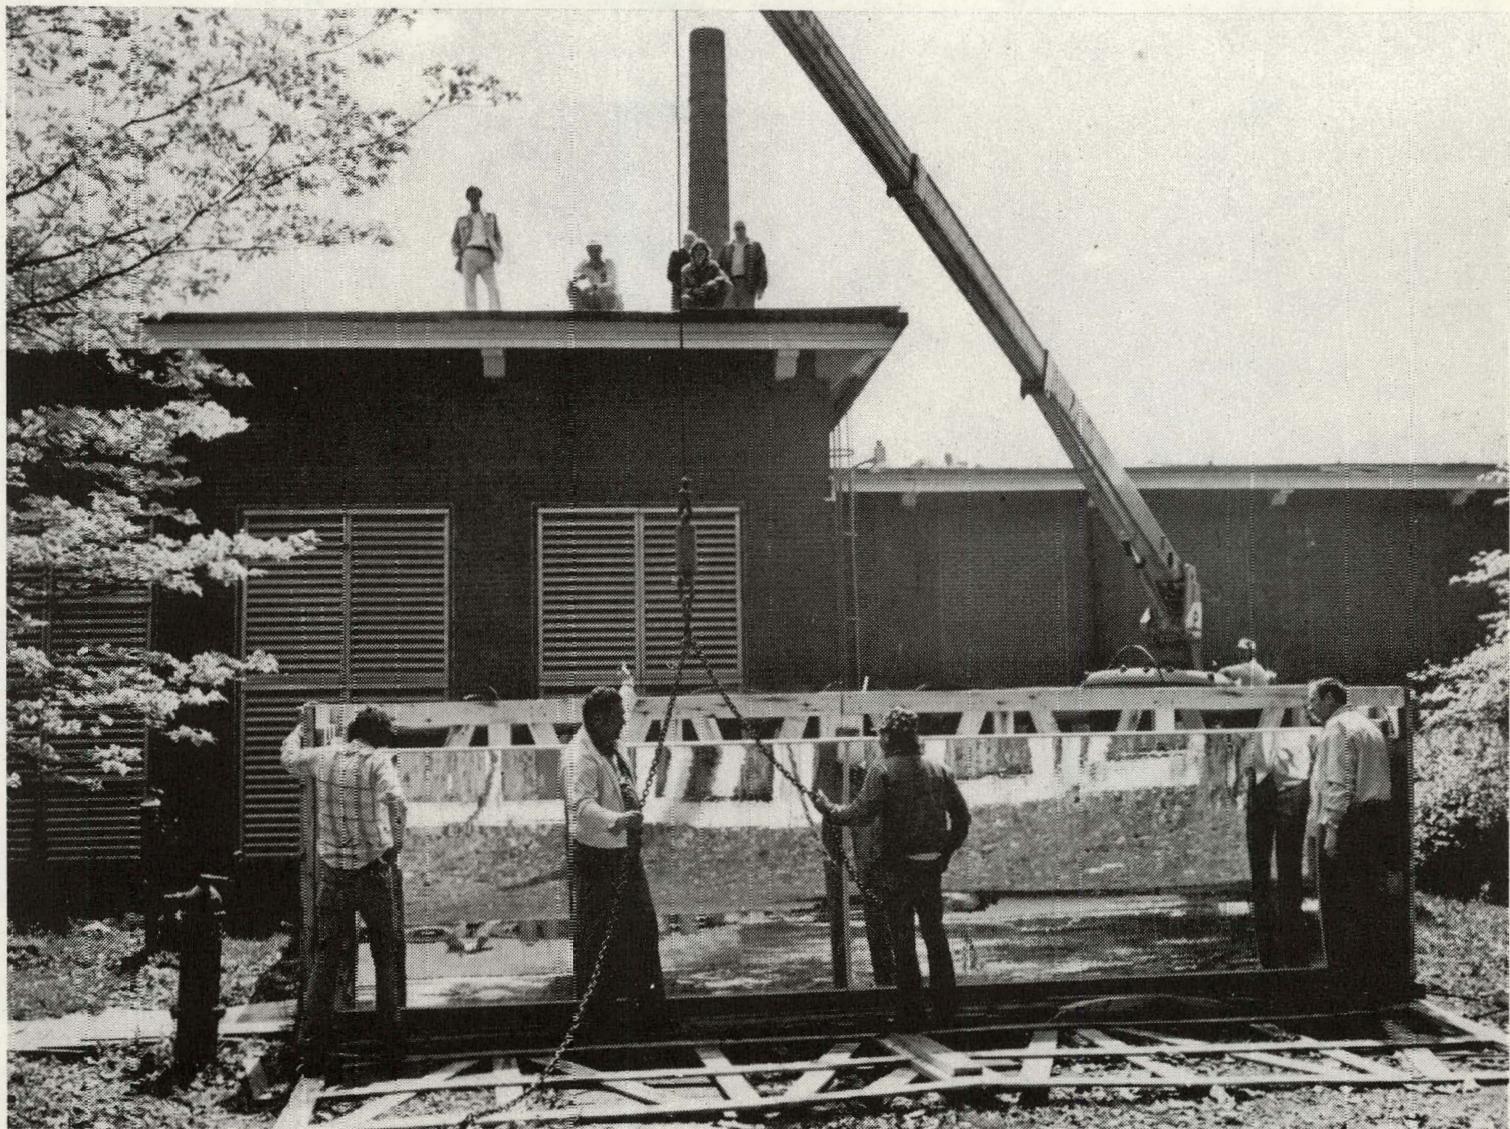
Collector Mirror Assembly Being Lifted from Shipping Crate, April 1978
